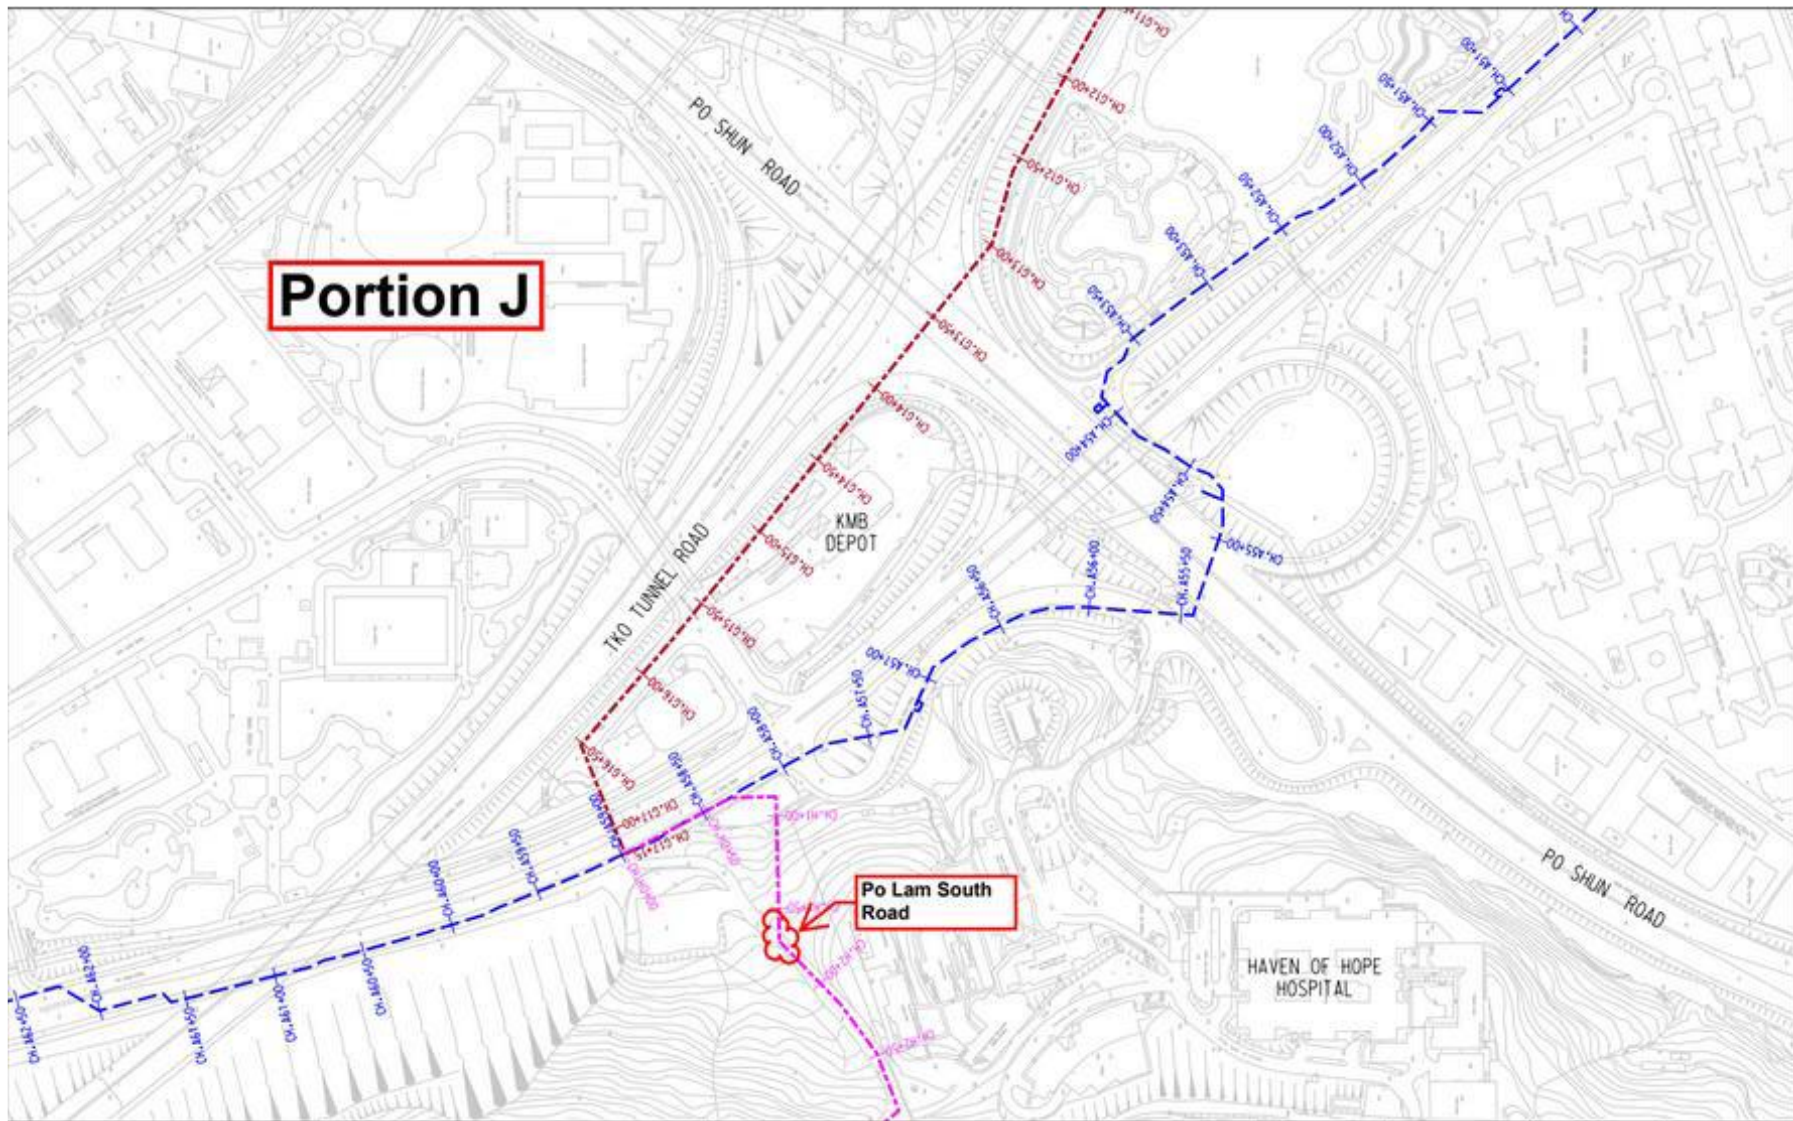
Location Plan for Portion J - Mau Wu Tsai 1 (Po Lam South Road 1)
